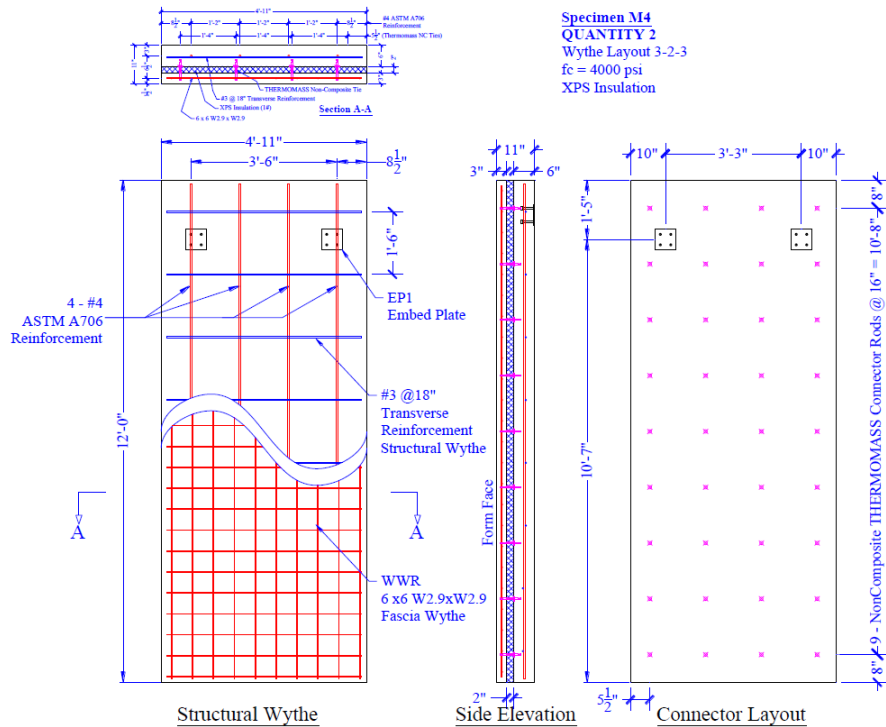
Specimen M4 Details (Naito et al. 2011)
